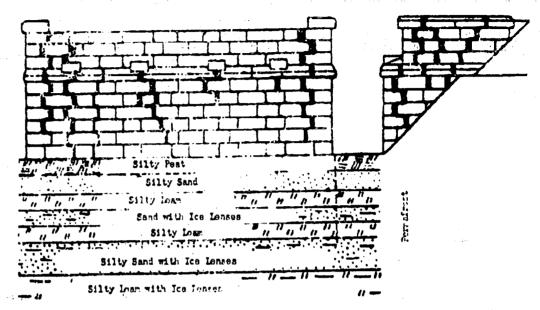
Abutment Deformation Caused by Permafrost Thawing
